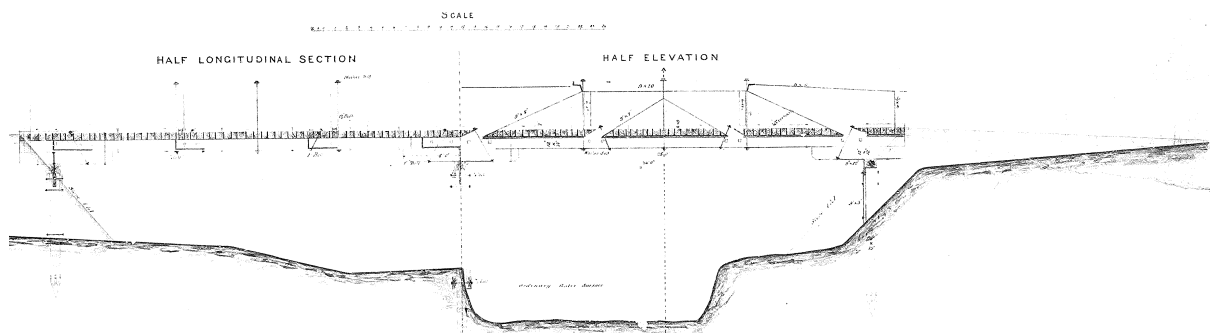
Bennett's Bridge over Farmers (or Junction) Creek, Western Road, 1858 (approx 30' spans)
